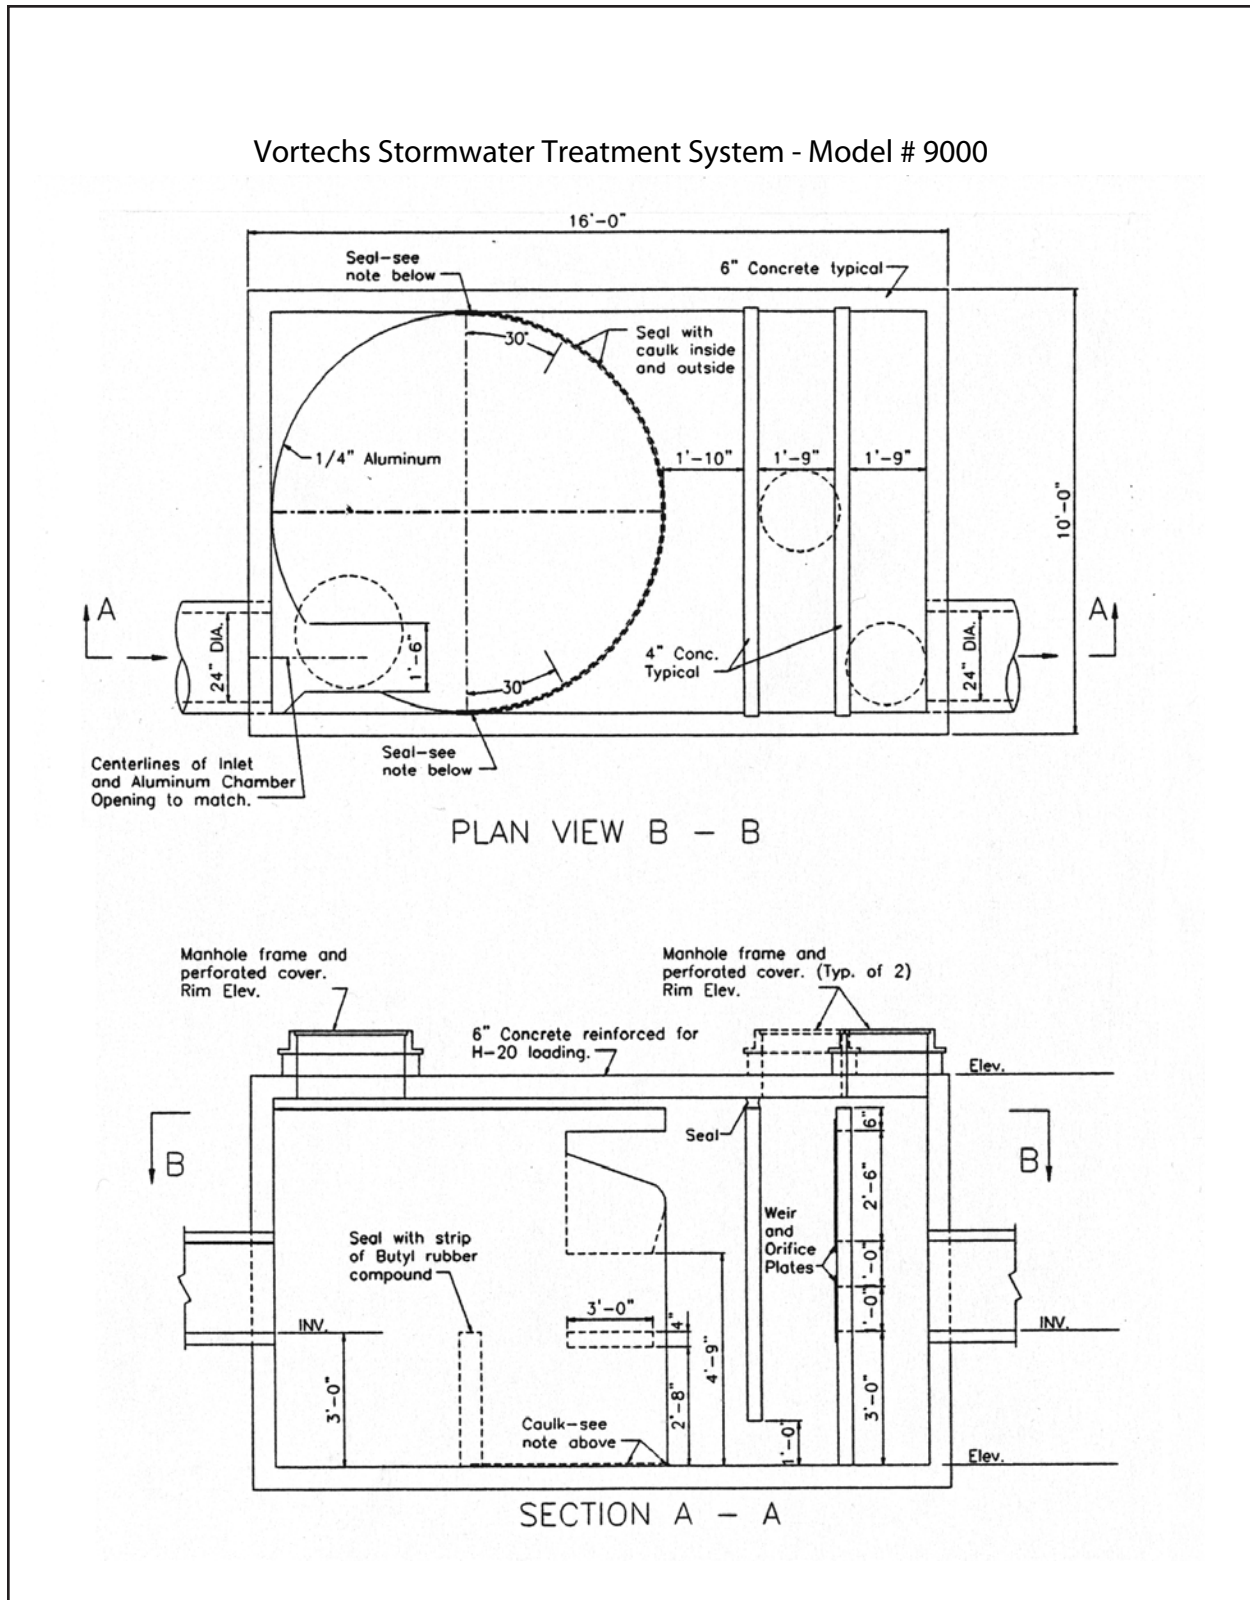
Example of Manufactured Separator System, Vortex Configuration (Adapted from Virginia Stormwater Management Handbook, 1999)
